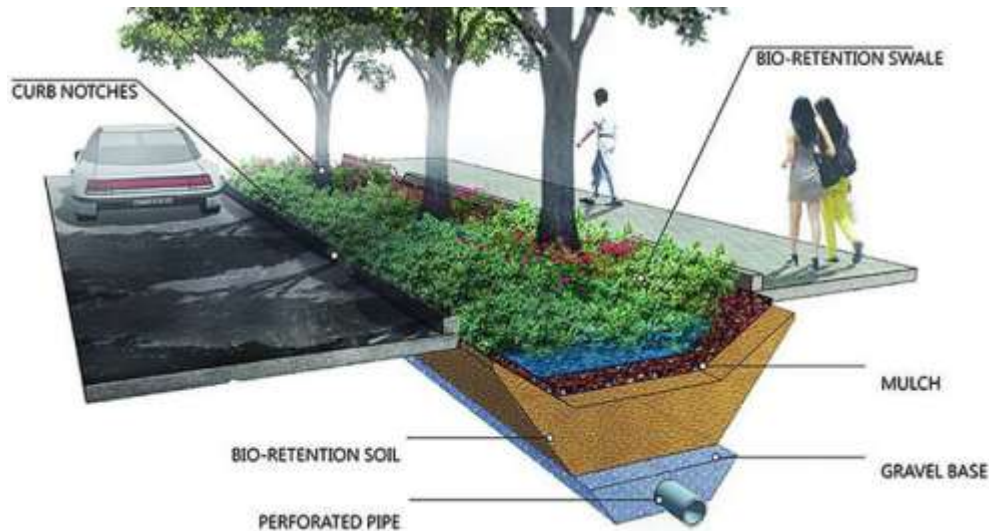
A Typical Cross-Section of a Parking Lot Bioretention Swale System (photo credit by Bay Area Bioswale)
